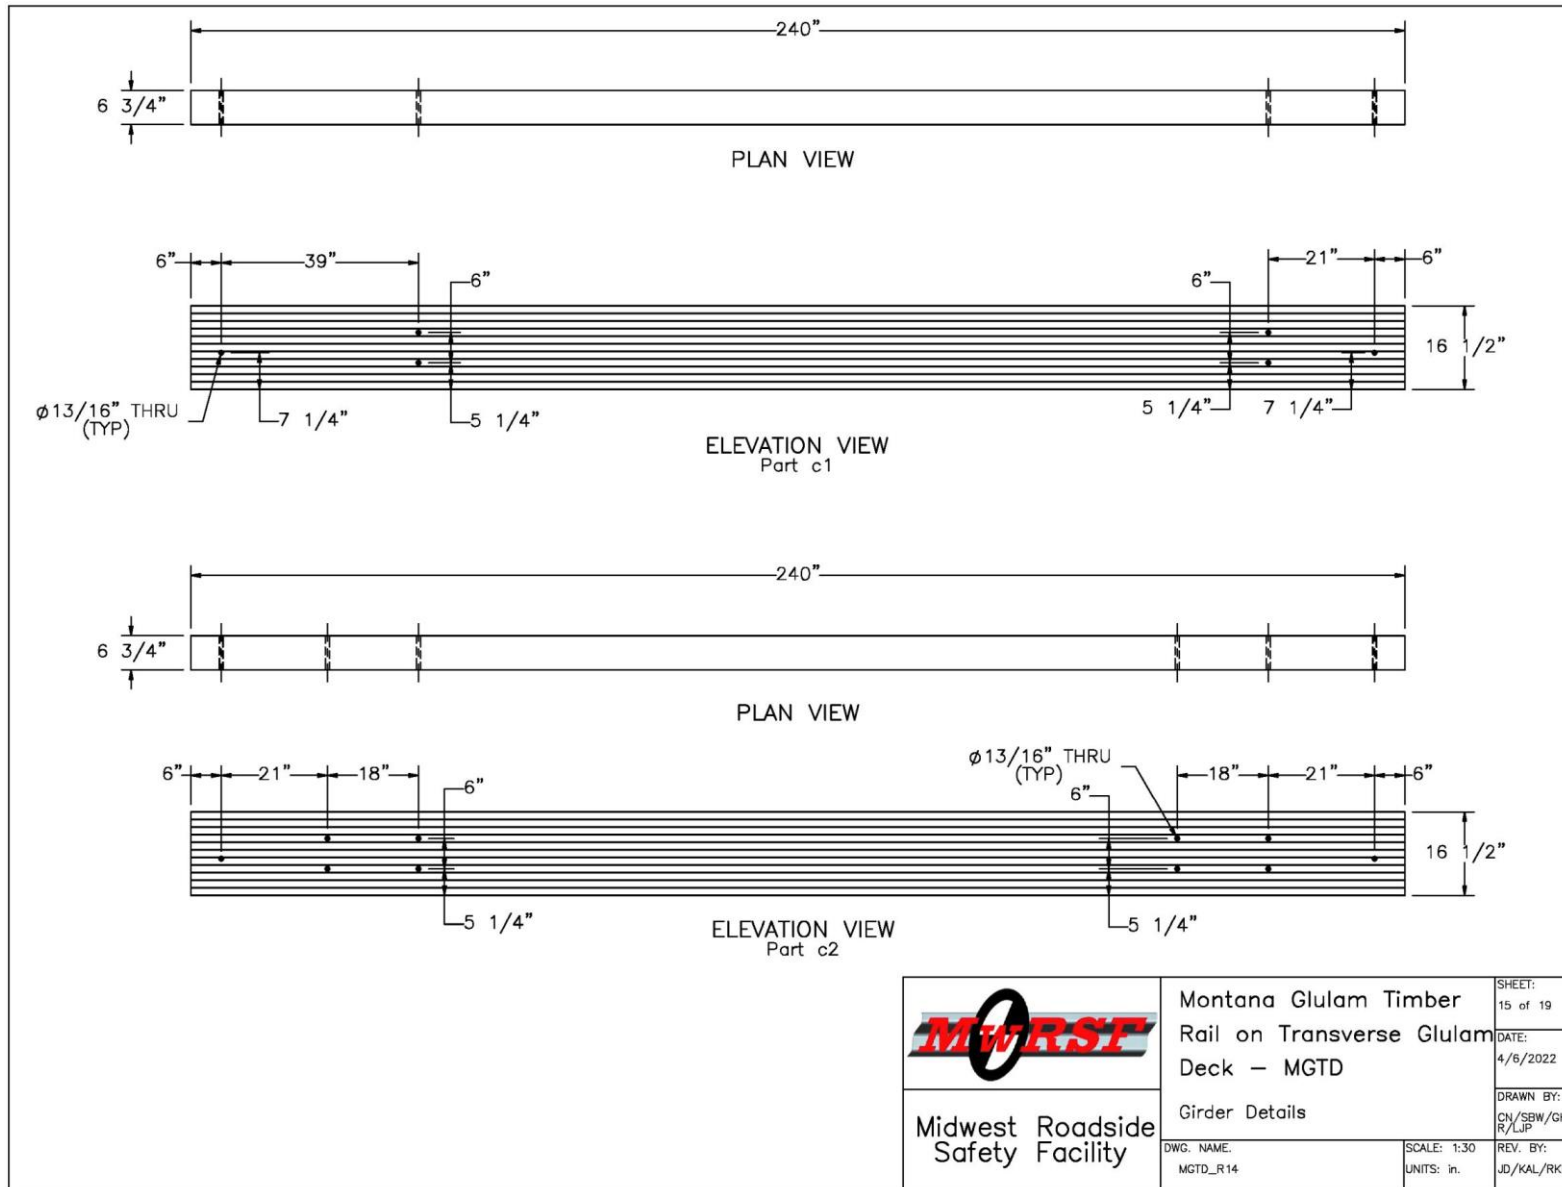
Girder Details, Test Nos. MGTD-1S and MGTD-1D
